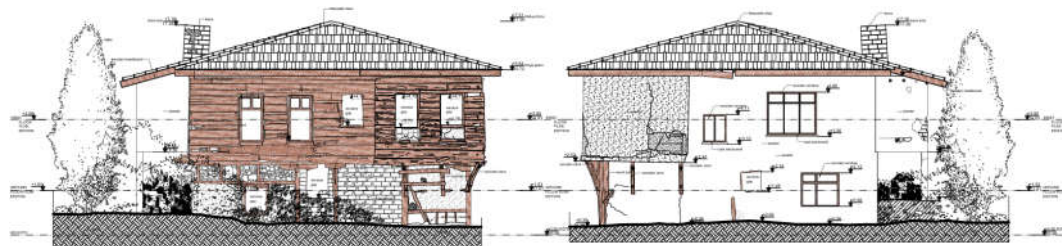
Survey Drawing of the Building: Southern (Left) and Northern (Right) Facade
